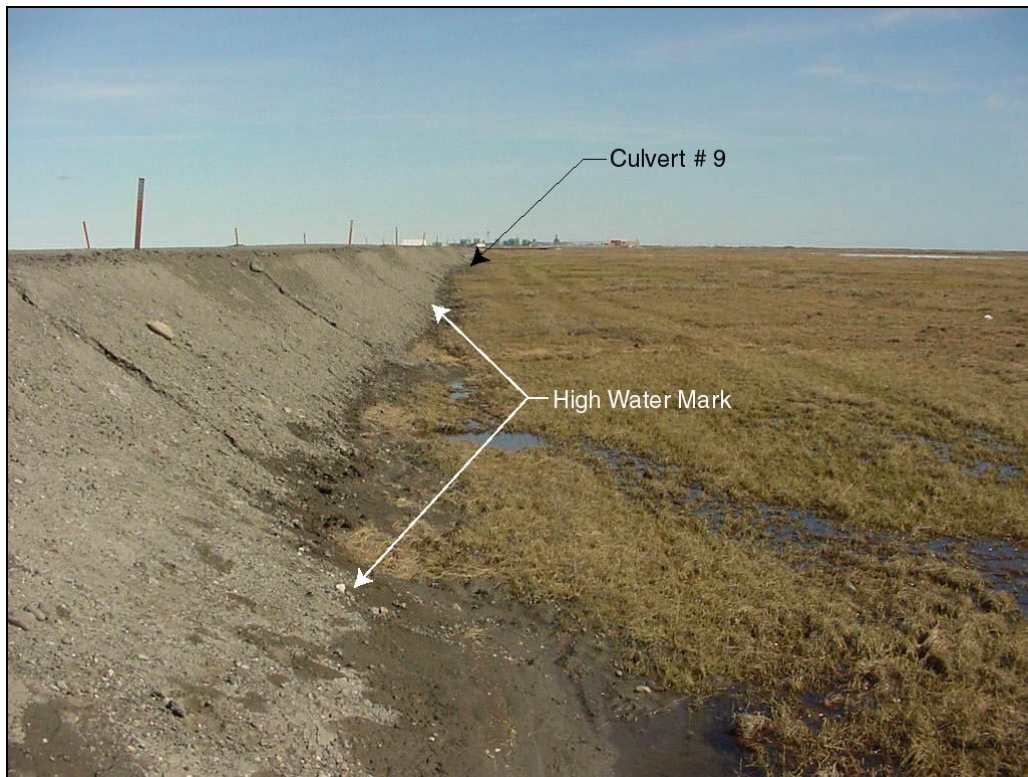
Facing east from Culvert #16 along the north side of the CD-2 access road. Photo taken June 16, 2001.
